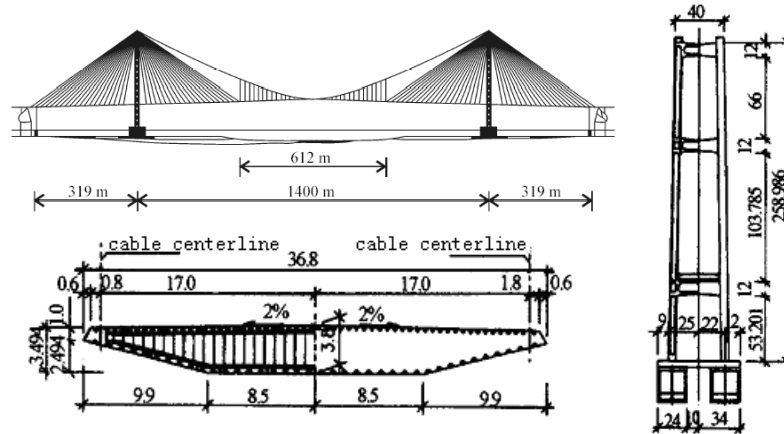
Elevation of the example cable-stayed-suspension hybrid bridge (Unit: m)
